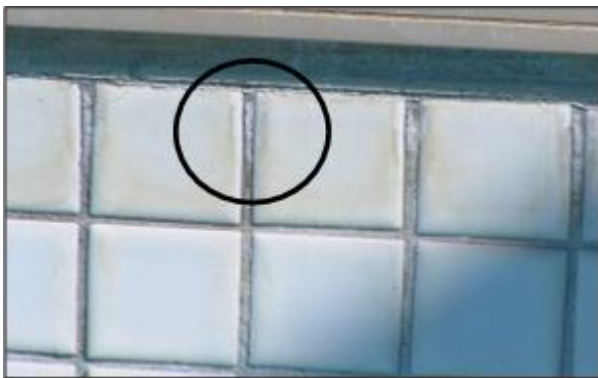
Showing telltale efflorescence on tile grout indicating water passing out from pool shell.
